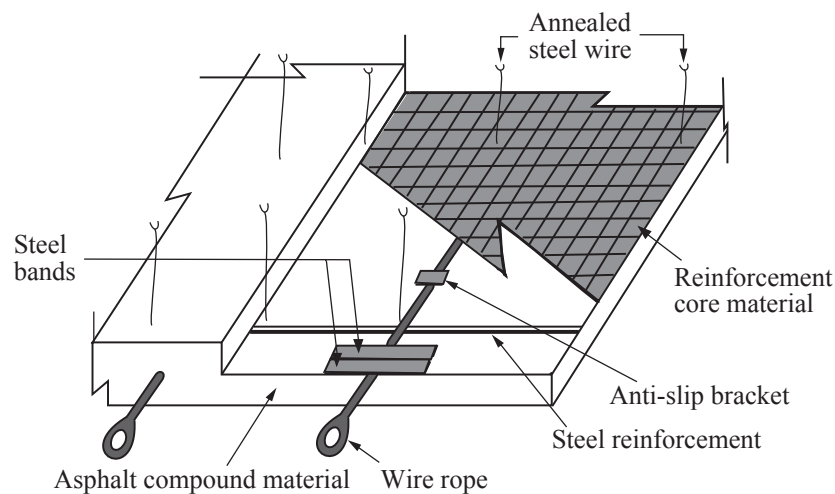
Example of Structure of Friction Enhancement Asphalt Mat
